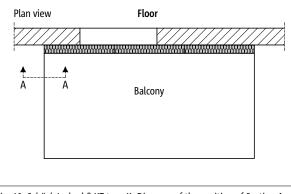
Schöck Isokorb® XT type K: Diagram of the position of Section A - A
